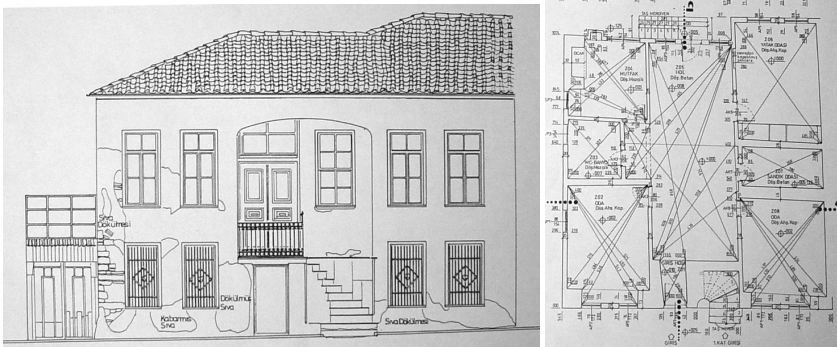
Kanser Vakfi Front Elevation and First Floor Plan
